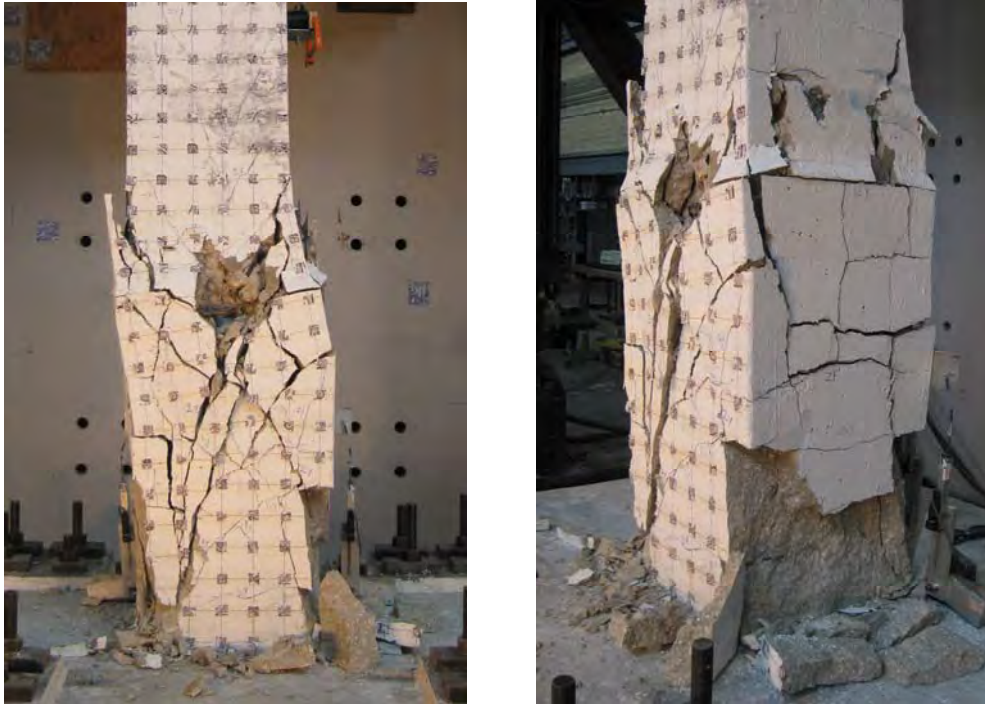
Condition of specimen at failure: cracks pattern producing the spalling of the 2in cover
